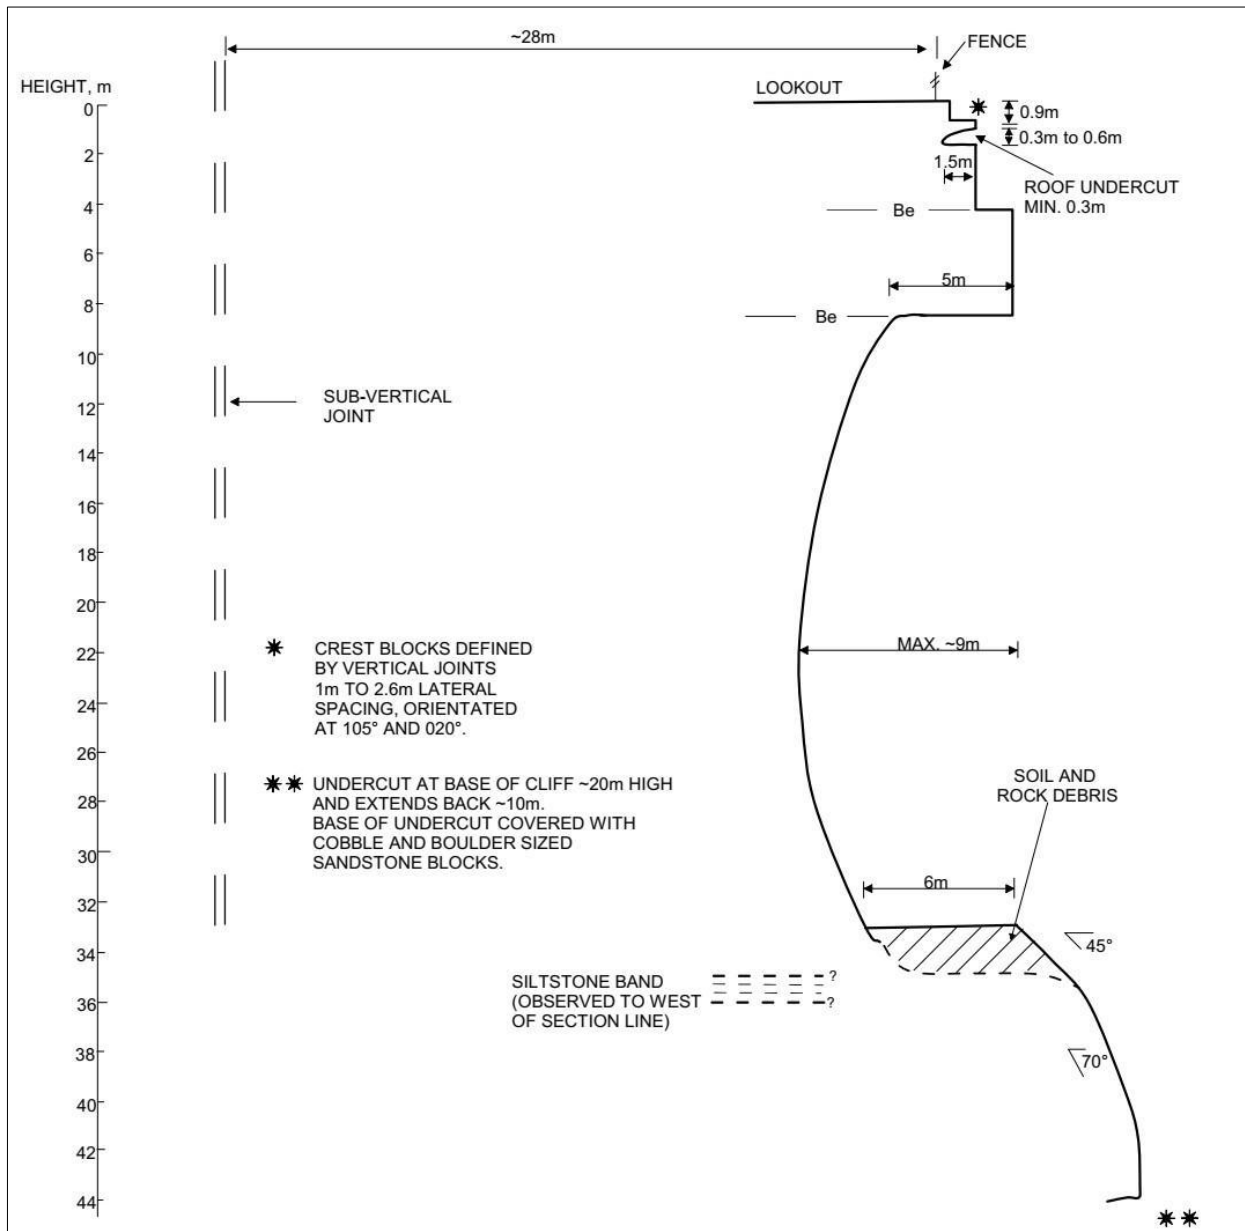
Cross-sectional sketch of the cliff face and cliff top area at Lookout One (looking east)
